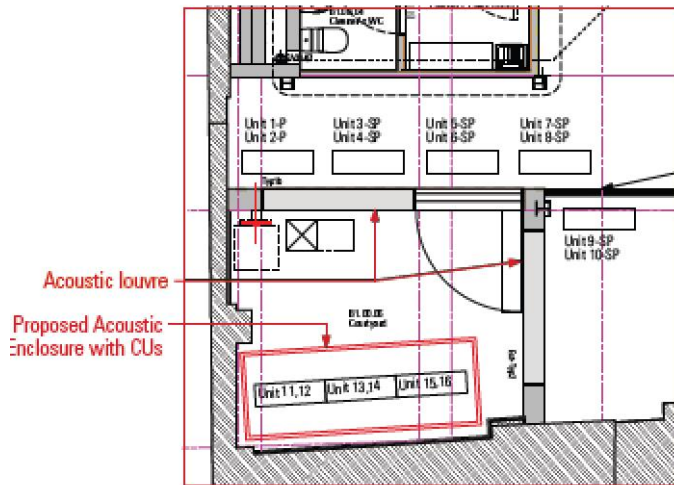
Proposed plan with location of independent acoustic enclosure
